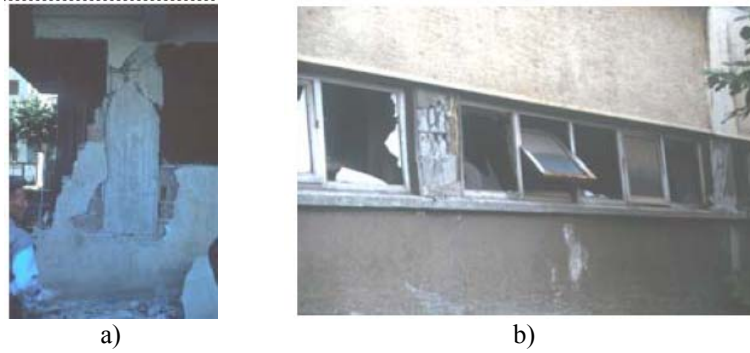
Column shear failure Damages on masonry infill walls
